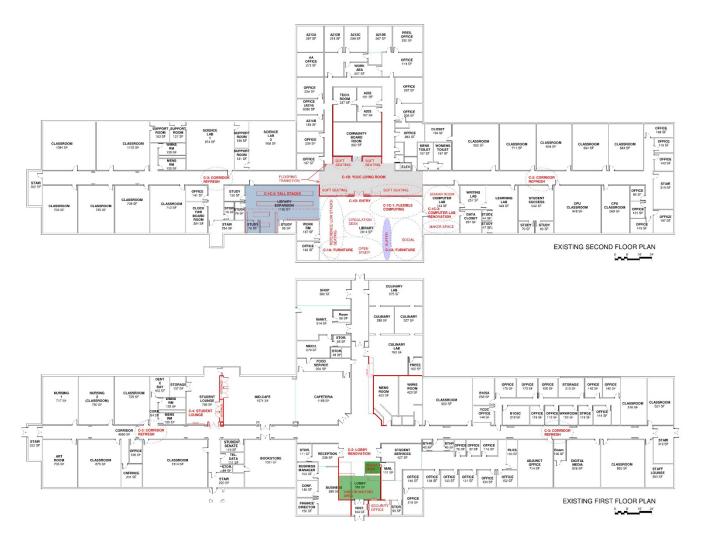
Overall Floor Plan Diagrams of Proposed Interior Renovation Areas
